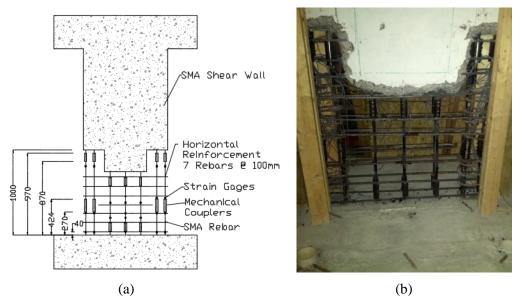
Reinforcement layout in the repaired region of Wall RW2-NR: (a) Schematic drawing, and (b) Photo
